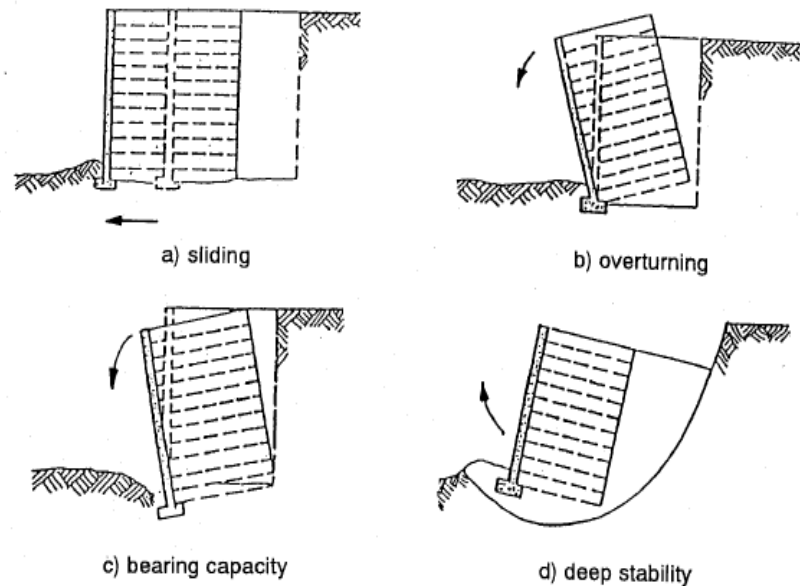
Potential external failure mechanism for reinforced soil wall (FHWA 2001)
